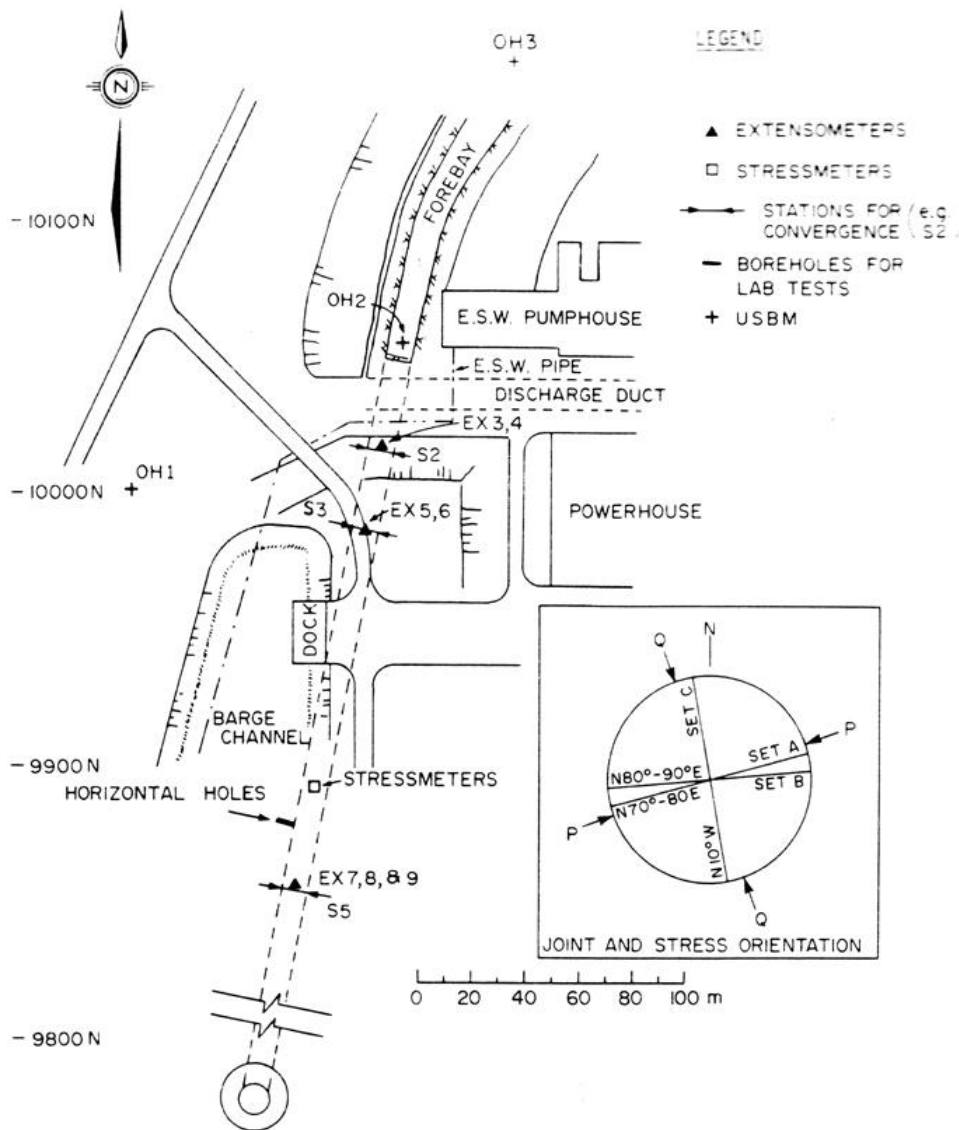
Plan View of the Darlington Tunnel (After Lo & Lukajic, 1984)
